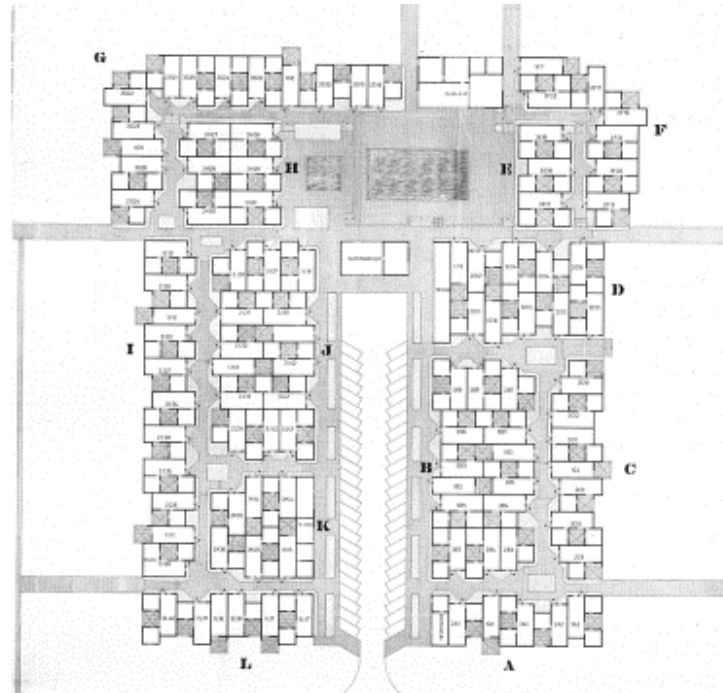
The Santa Ana apartment ensemble_General layout. Ground floor
